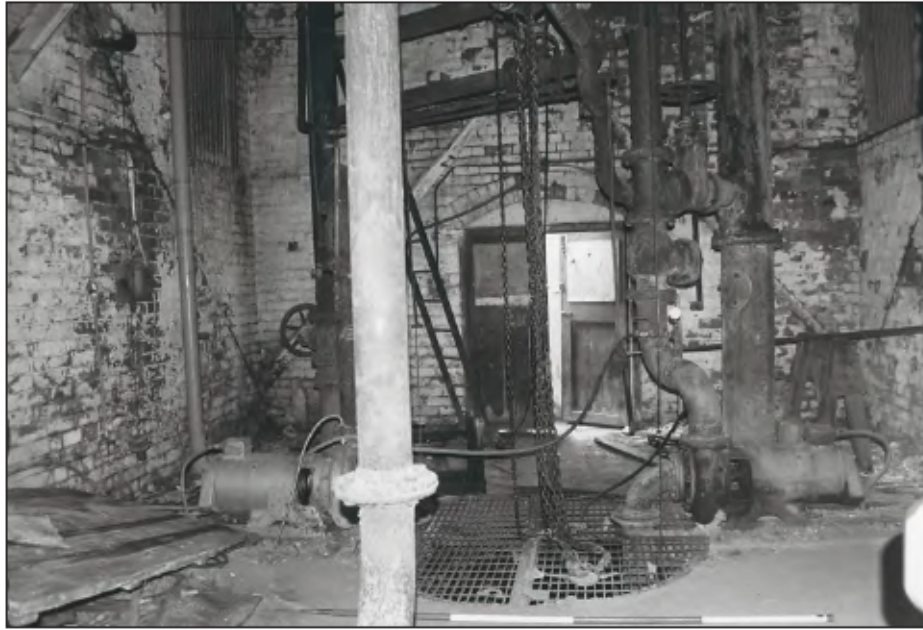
General view of pumps and well within water tower, Building 10. (film 27.16)
